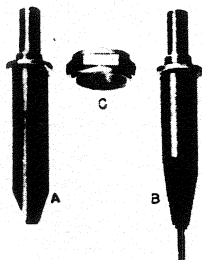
Standard wiping sleeve for sealed cutout (A), special entrance terminal for rubber-covered cable (B), and union nut (C), usable with either. These terminals are interchangeable.
